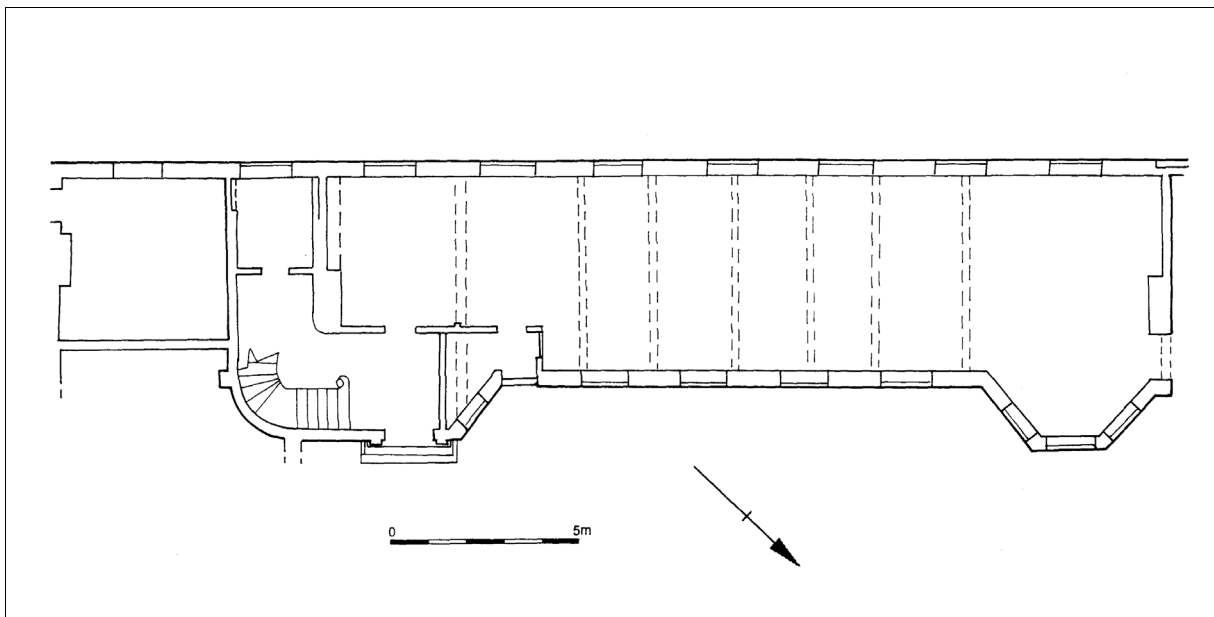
General ground floor plan of building 1, Cornish Place (© ARCUS)
